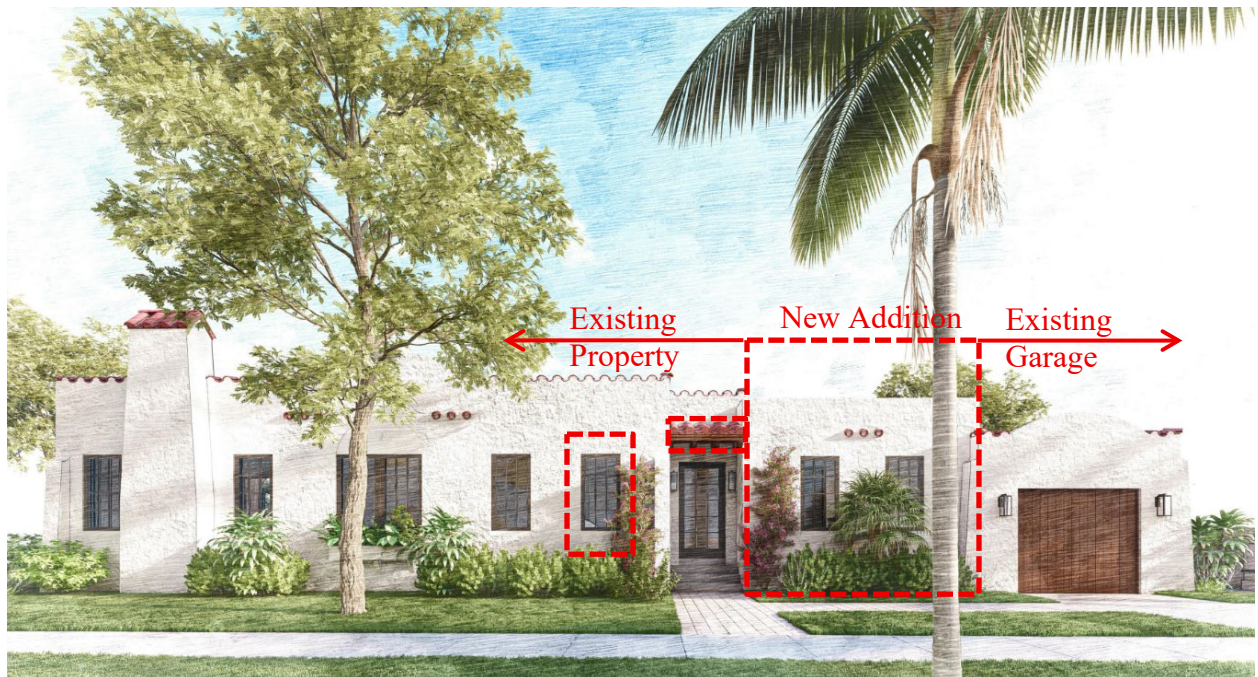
Existing Building Aragon Avenue | January 13, 2026
